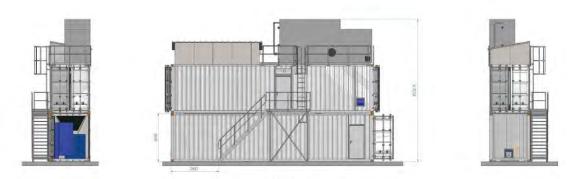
Elevation drawings of the structure provided by TechnoAlpin
